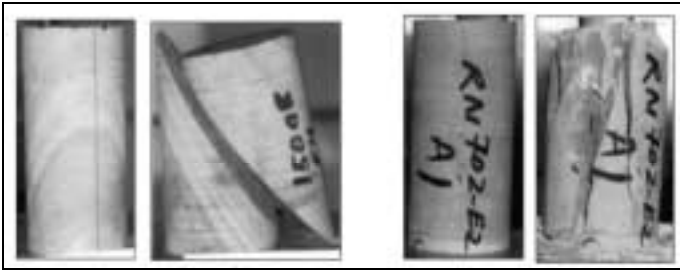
Typical structural (left) and non-structural (right) failures on cores.
